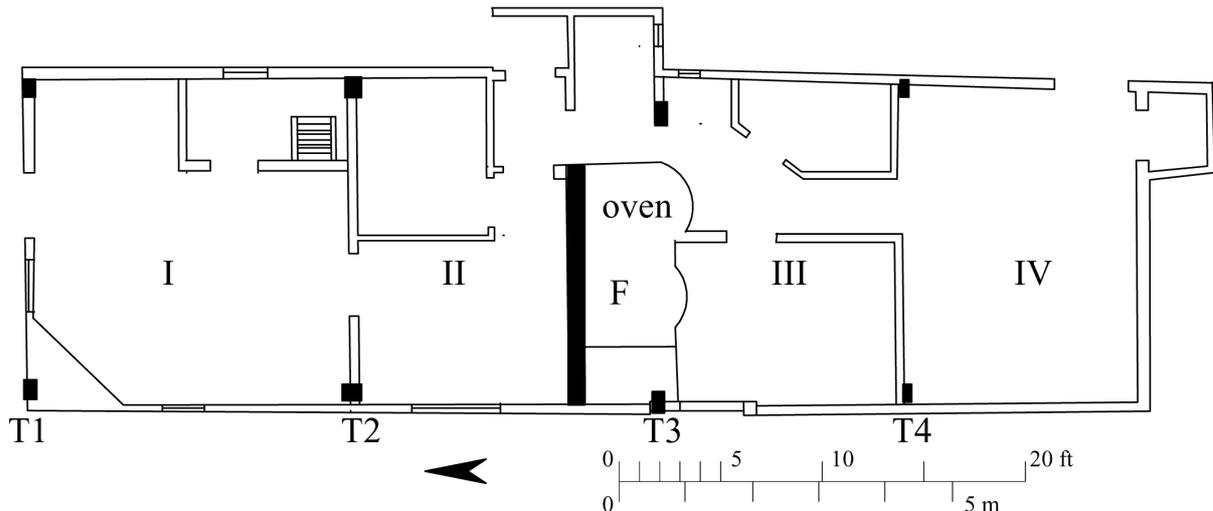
Plan, showing truss and bay numbering (after Webster (1954)).
